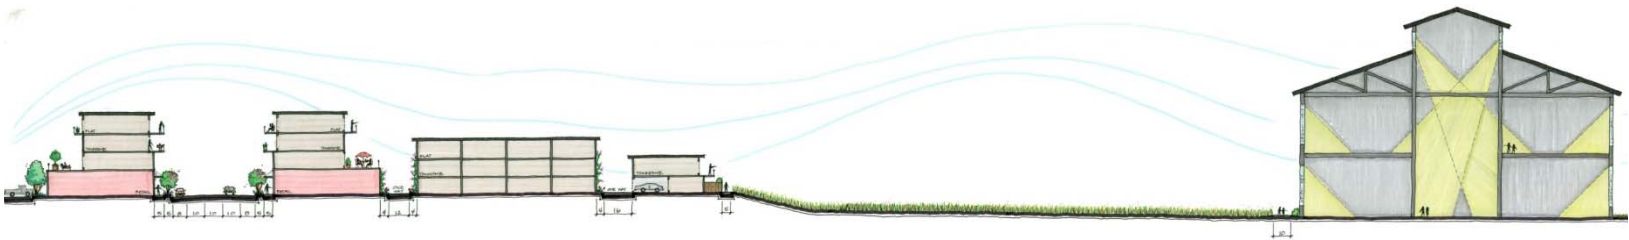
Open Space Section A-A Enlargement depicting Warehouse in relationship to new development (N.T.S)
